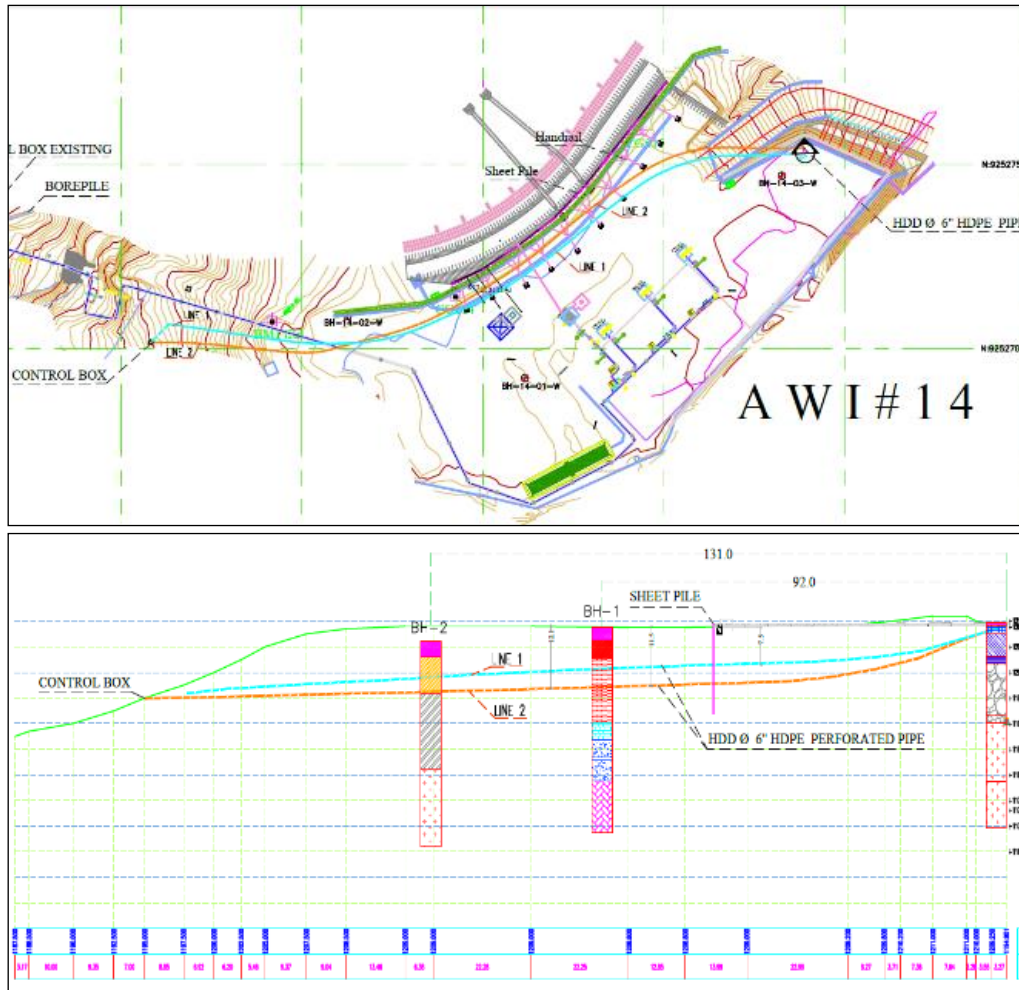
Two (2) line of Awi-14 Well pad horizontal deep drain layout and cross section
